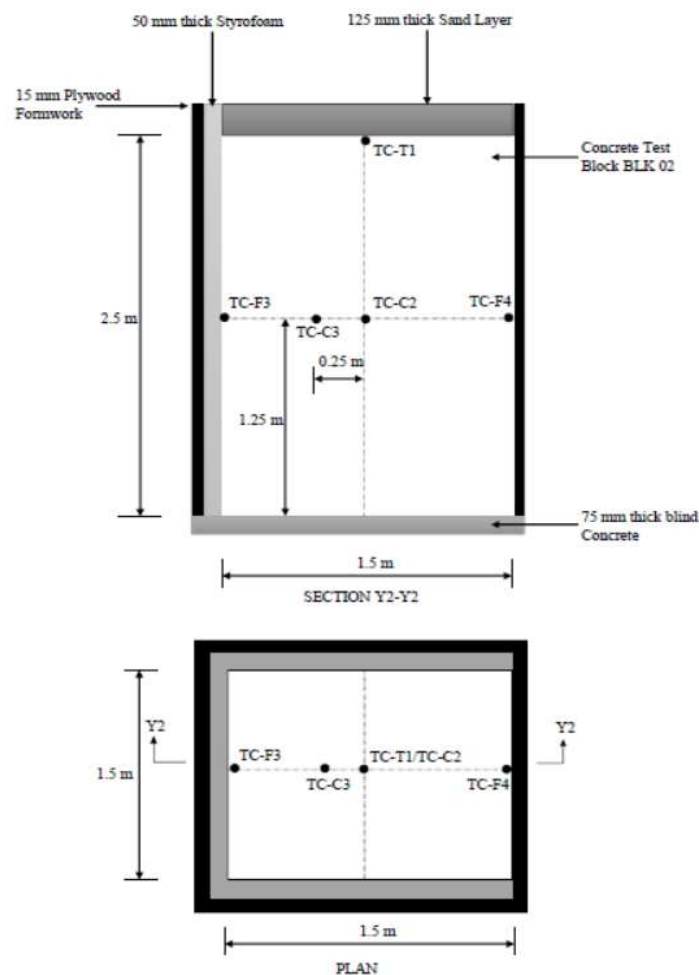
Geometry and Locations of Thermocouples for Concrete Test Block BLK 02
